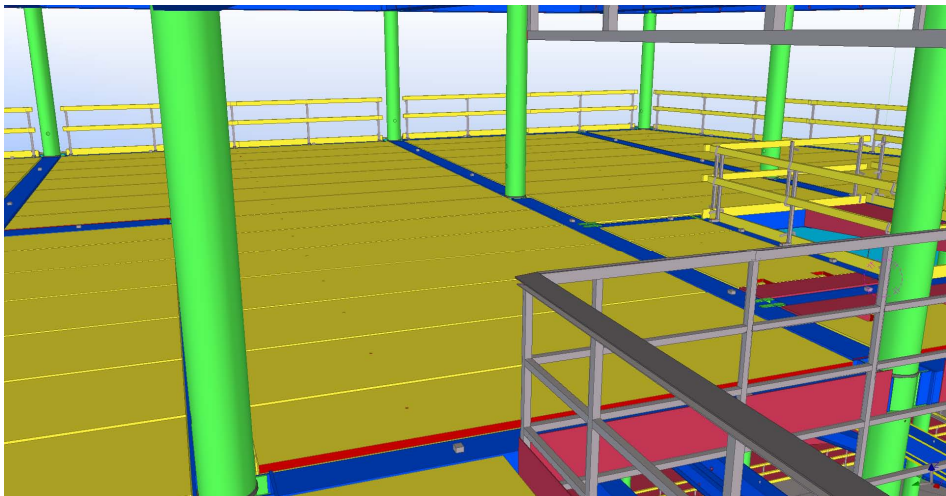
Temporary and permanent railings used for falling prevention during construction.
